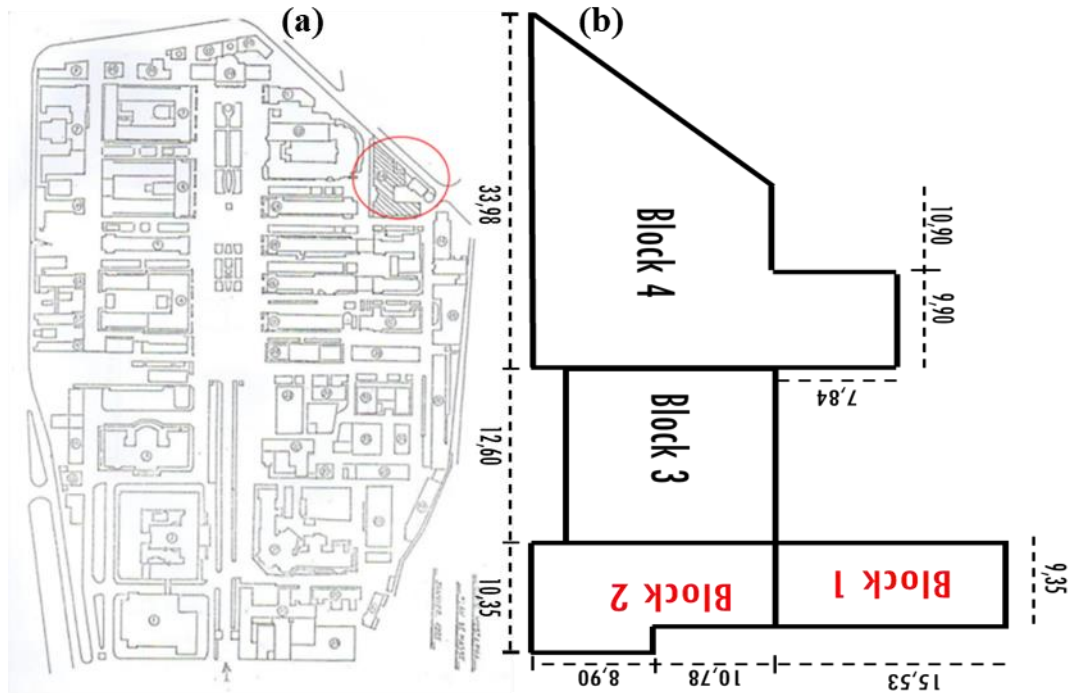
a) Layout Plan and b) Floor Plan of the Urology Pavilion, CHU Mustapha Pacha.
